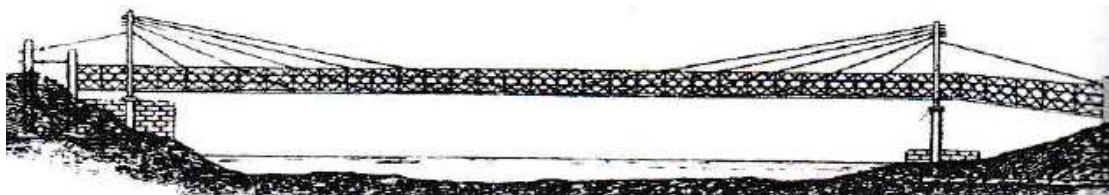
2: First proven constructed cables-stayed bridge: Kings Meadow Bridge, 1817 (Stephenson, 1821 apud Svensson, 2012).
